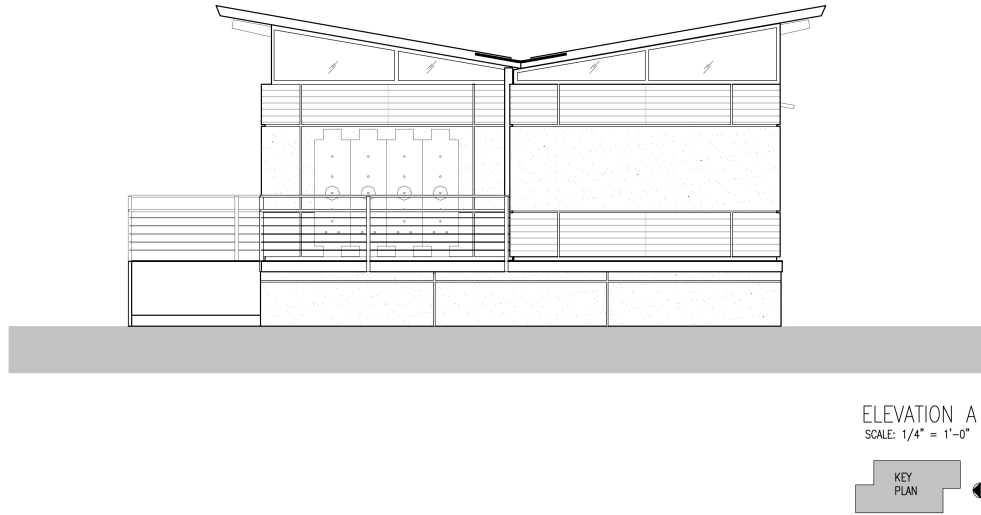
PeaPoD Elevation Drawing A. (Images: Perkins + Will)
